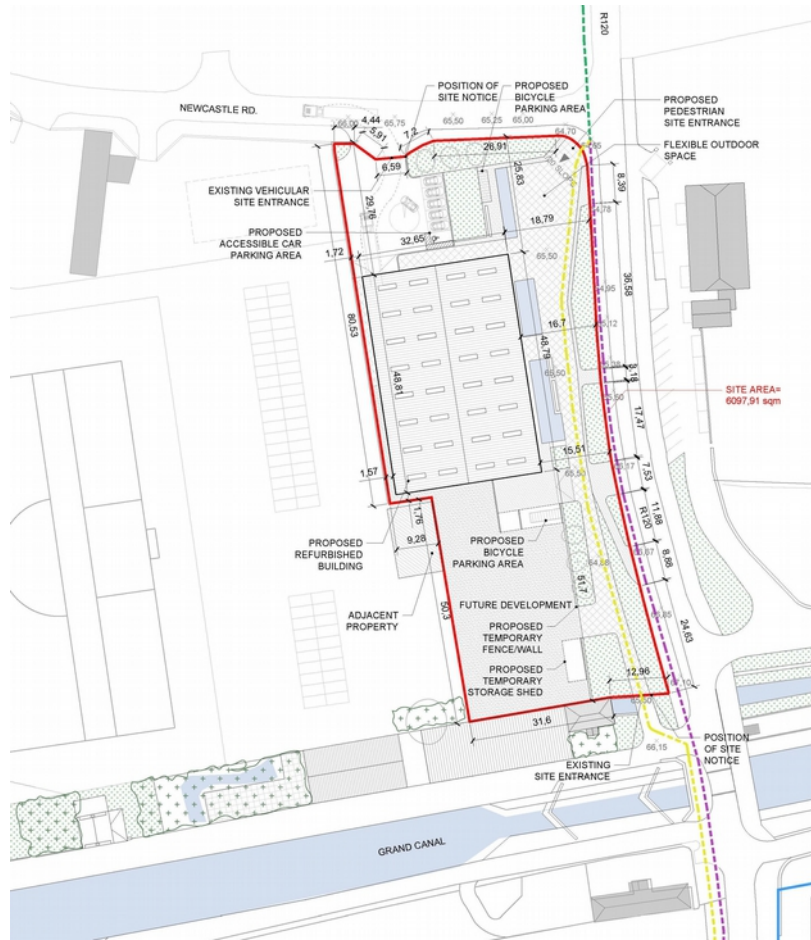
Site plan showing the site proposals for the new development. Source: Stephen Foley Architects
